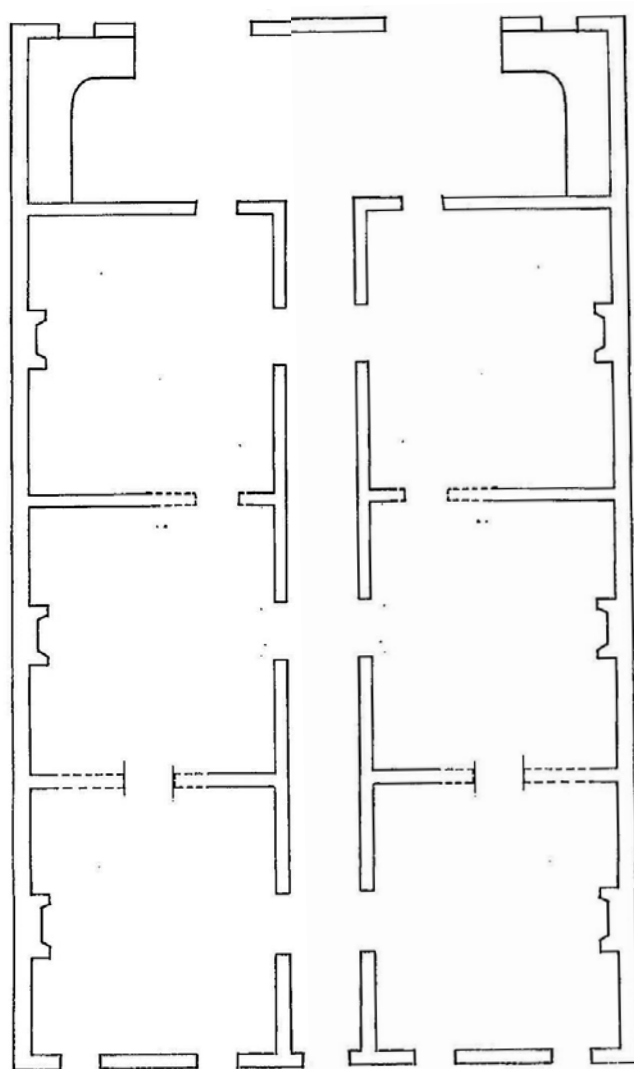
Floor plan of 416-418 Burgundy Street. Reconstructed by Naohito Okude. 1986.
